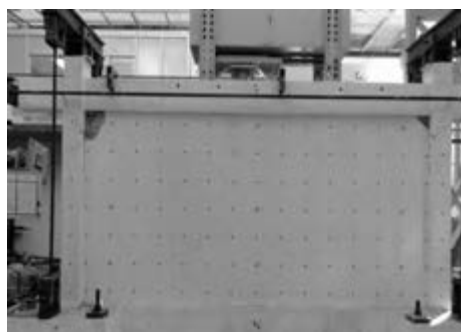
Un-reinforced masonry infilled non-ductile with column shear failure and corner panel crushing at 0.25% drift
